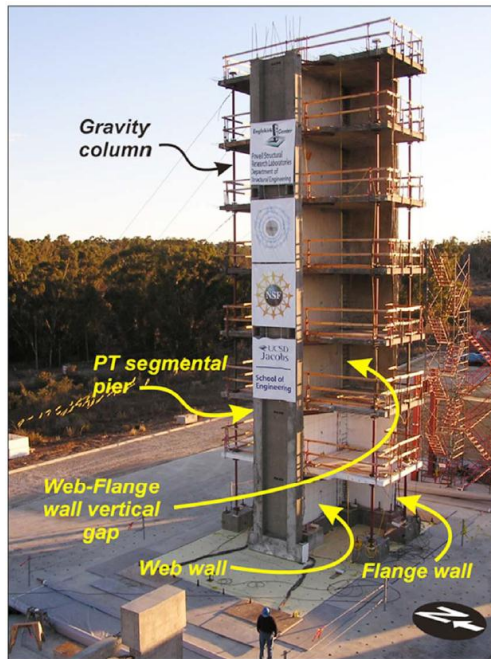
Picture of Seven-story Reinforced Concrete Building Slice. Panagiotou, M., and Restrepo, J. (2010), “Displacement-Based Method of Analysis for Regular Reinforced-Concrete Wall Buildings: Application to a Full-Scale 7-Story Building Slice Tested at UC–San Diego.” *Journal of Structural Engineering* 137 (6): 677–90. Used under fair use, 2014.
